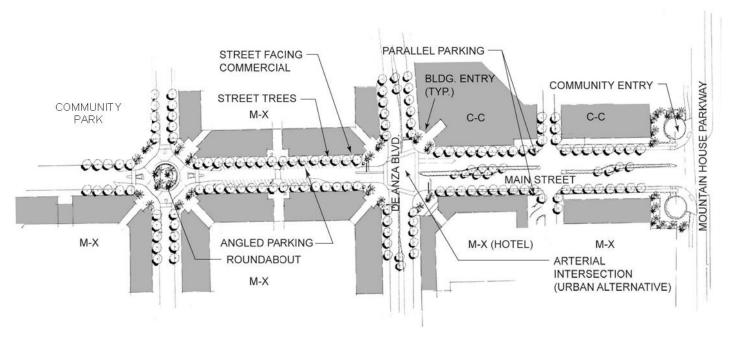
TOWN CENTER (SHARED PARKING ALTERNATIVE)
